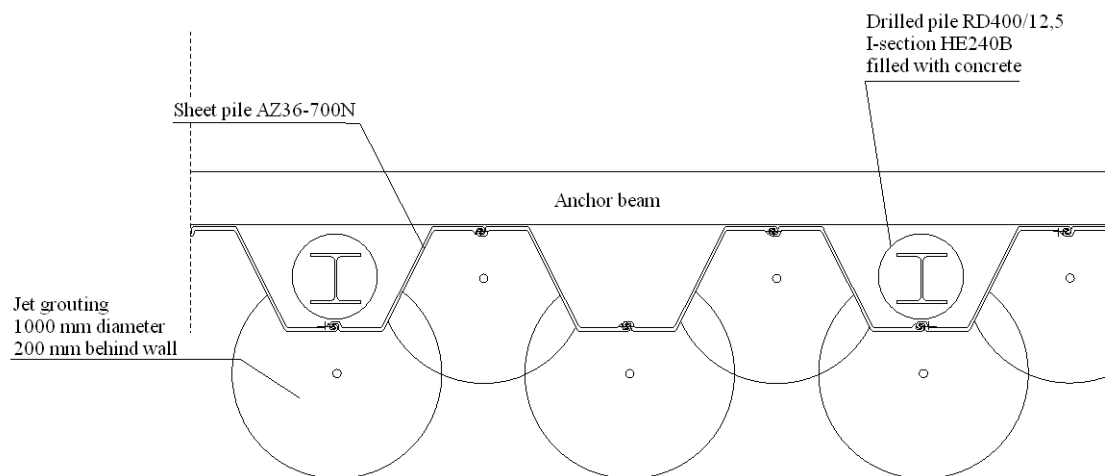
Plan of drilled pile supporting sheet pile wall (Finnmap Infra Oy.)
